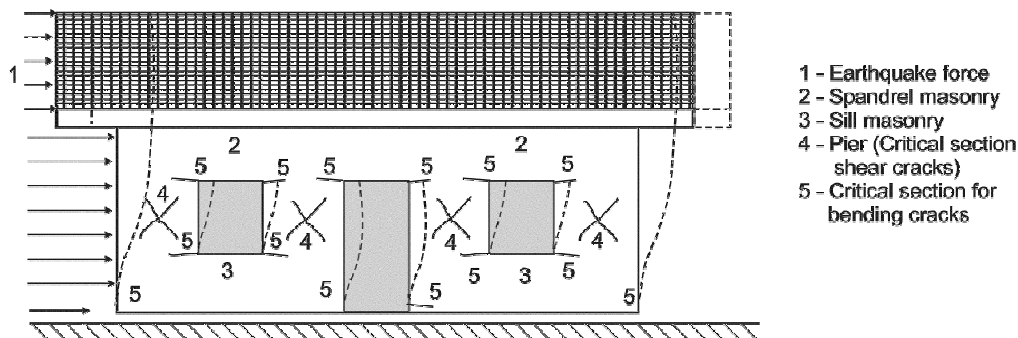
Critical failure modes in a masonry wall with openings, [102]
